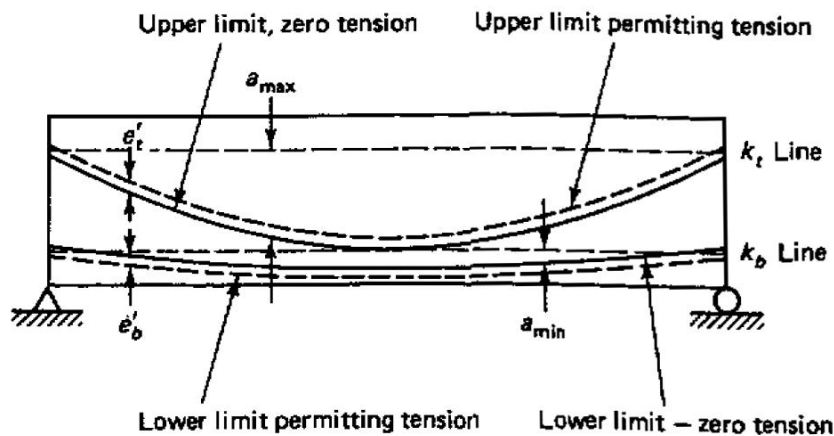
Envelope permitting tension in concrete extreme fibers.
